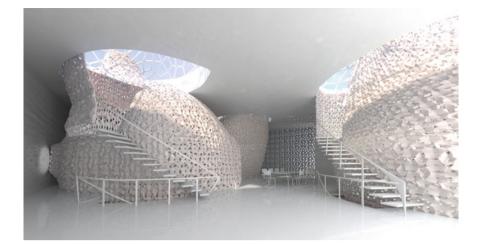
3D printed house 1.0 shows an interior space made of 3d printed mixture obtained by salt and glue constituting an efficient, translucent and inexpensive material (© Emerging Objects Corp.)
